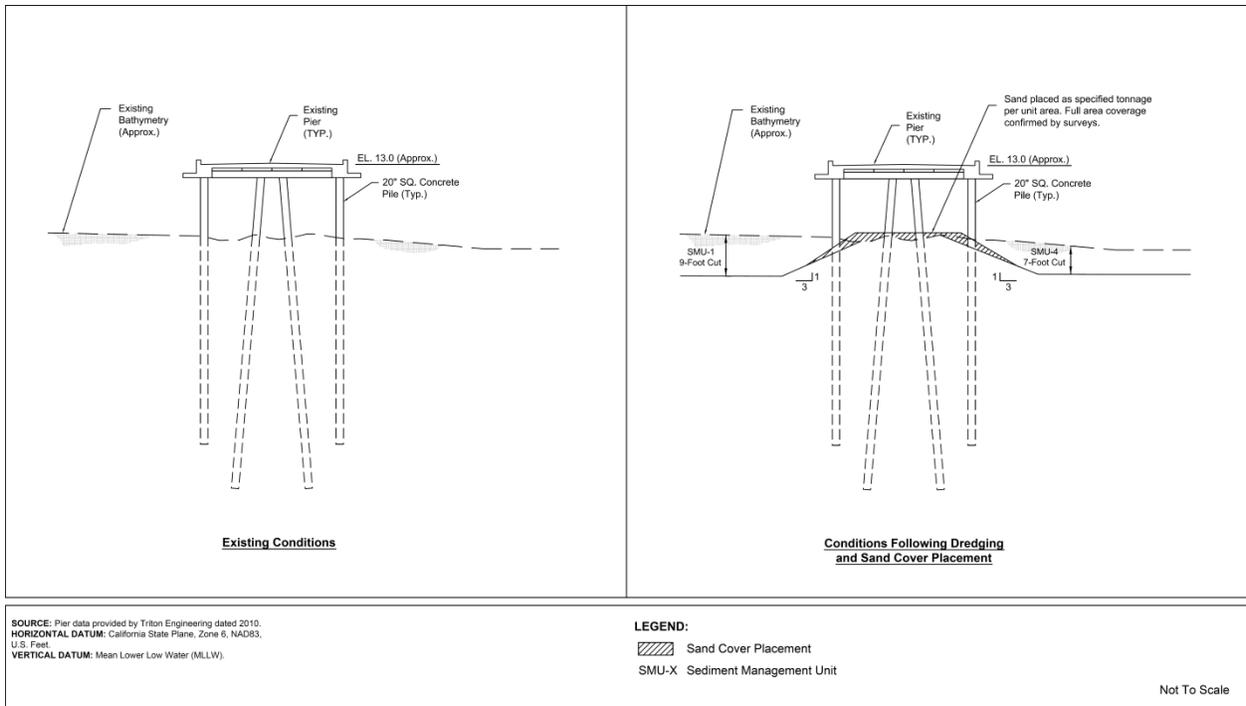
Typical Underpier Sand Cover Placement Cross-Section
